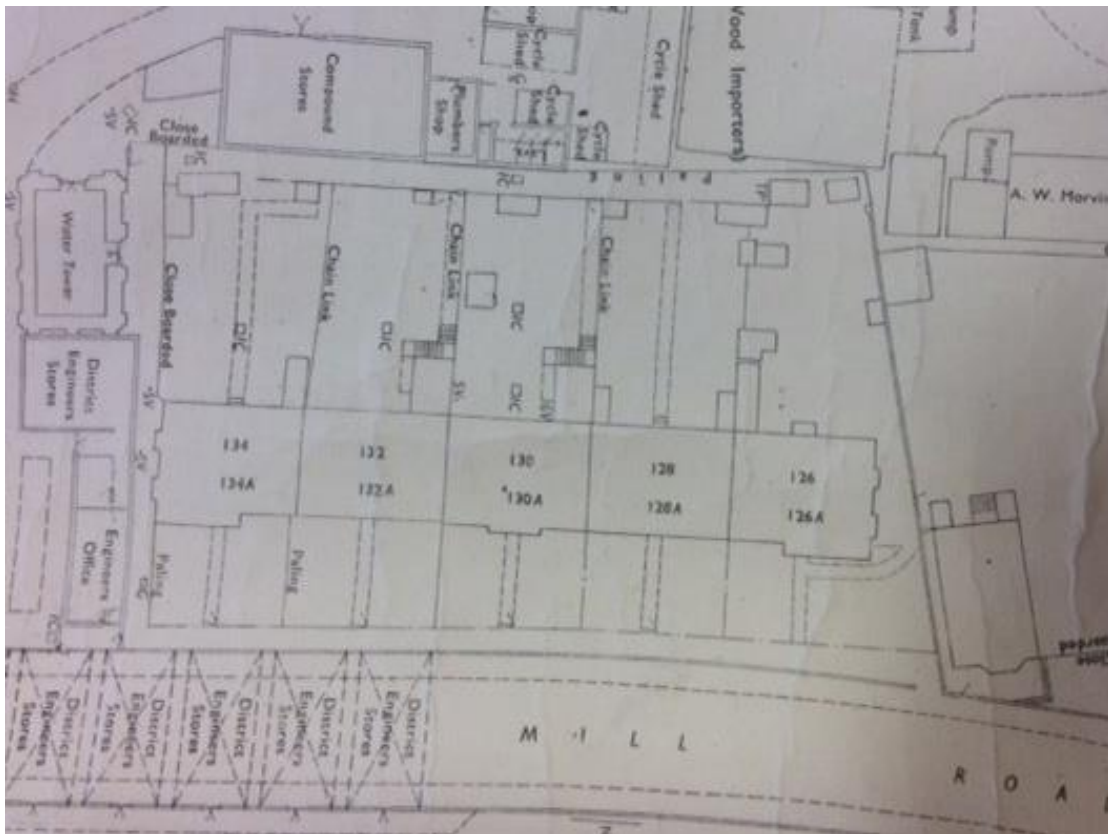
British Railways Plan Cambridge Station area, sheet 2 (1957) (CC)
